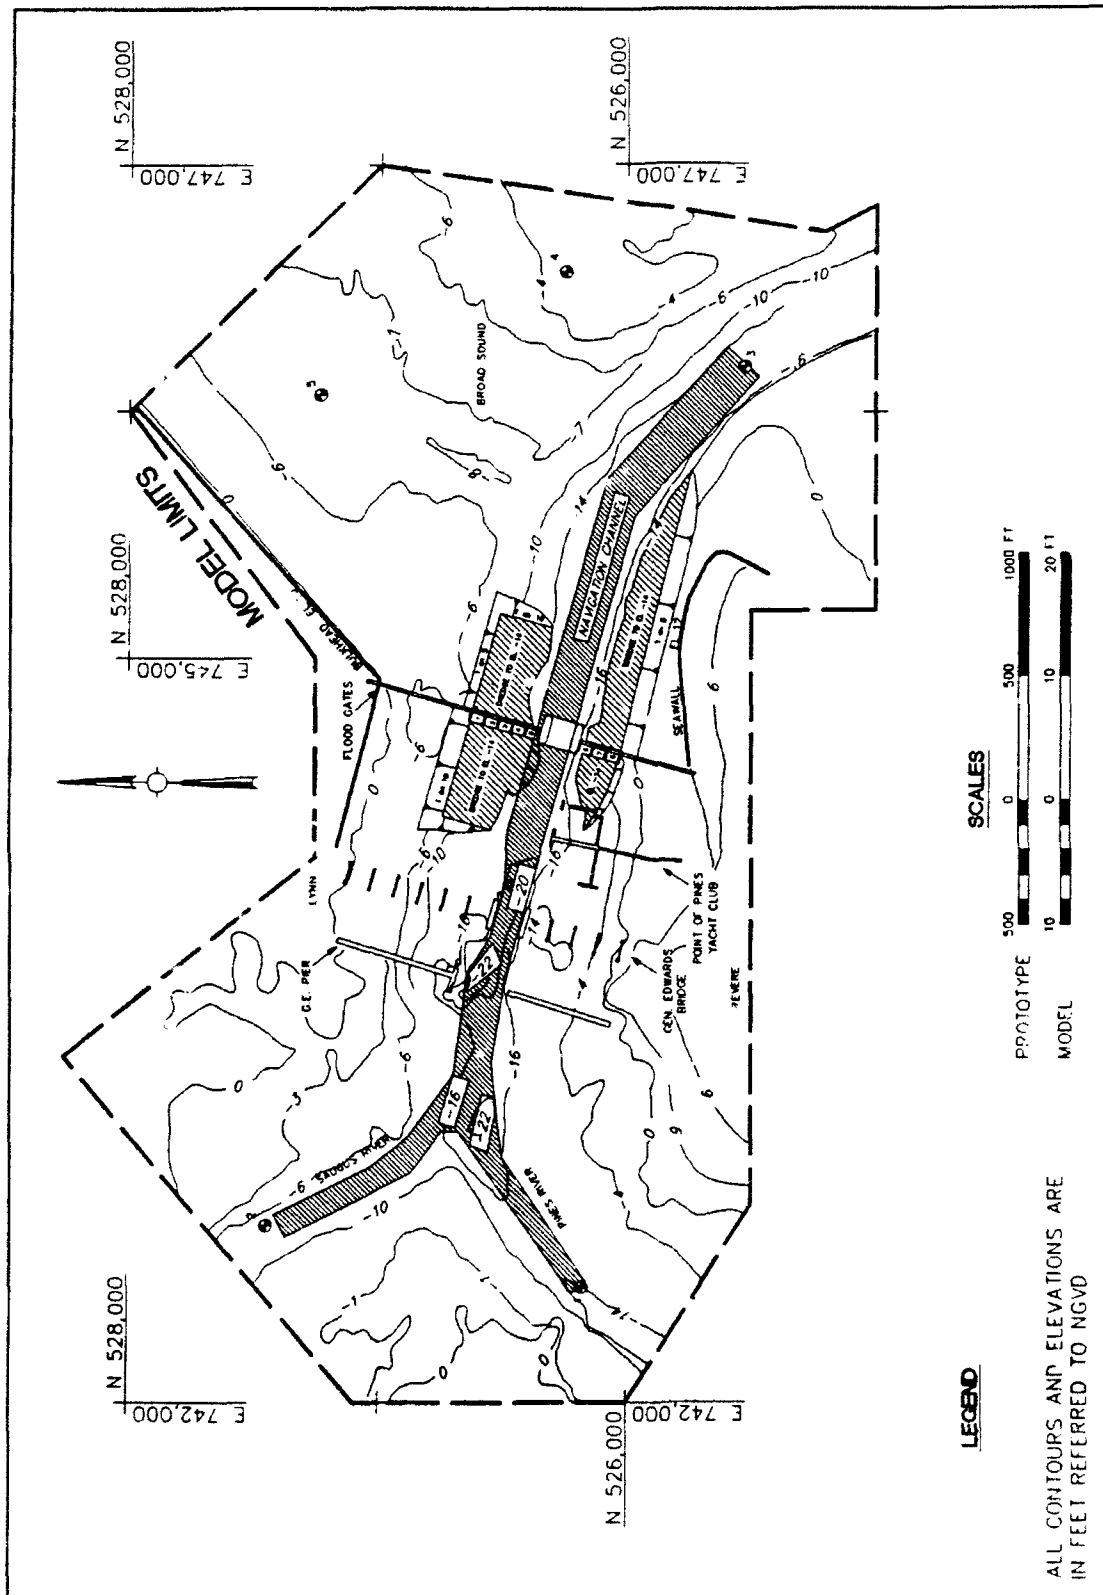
Layout and dimensions of Plan 2C+7 and the approach channel
